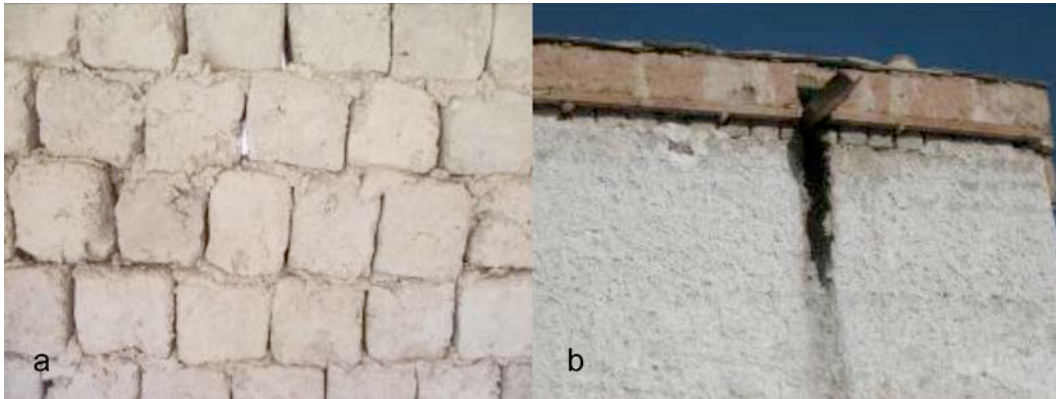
Kanji, Ladakh: (a) the lack of earthen mortar between the *pakbu* laid horizontally with incorrect *pakbu* vertical-joint design and; (b) a roof-drainage system, which does not work correctly, damaging the wall surface (credits: Désirée De Antoni, 2010 (a) and 2009 (b))
